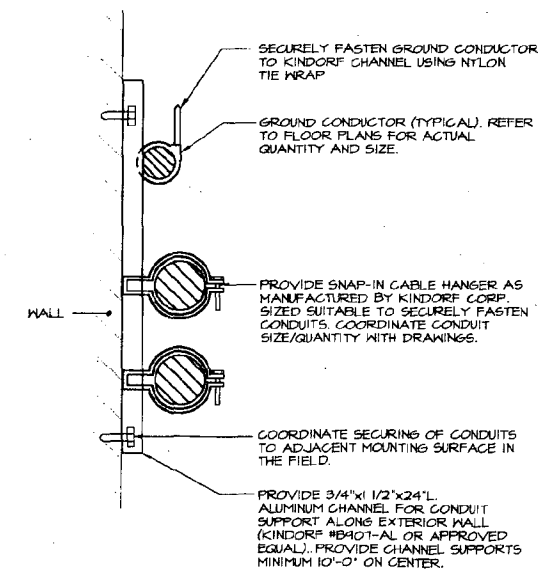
DETAIL - CONDUIT SUPPORT OFF ROOF
